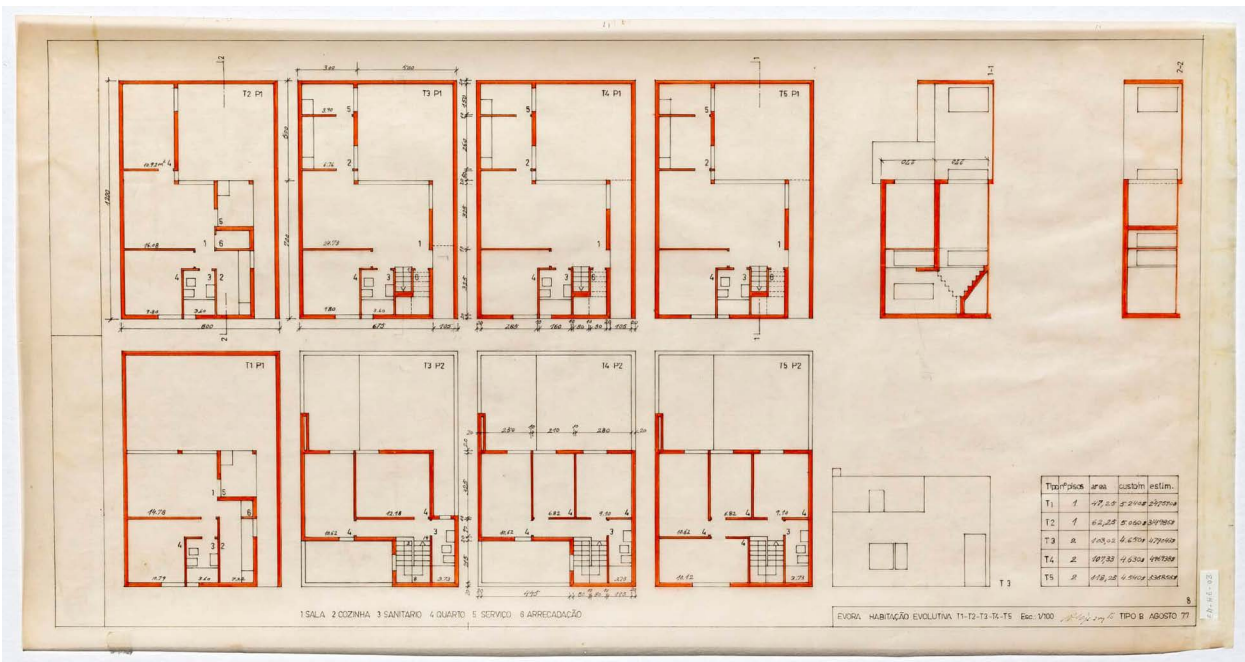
Alvaro Siza Vieira, Plan Configurations T1-T5 with both patio layouts, Evora, 1977.
